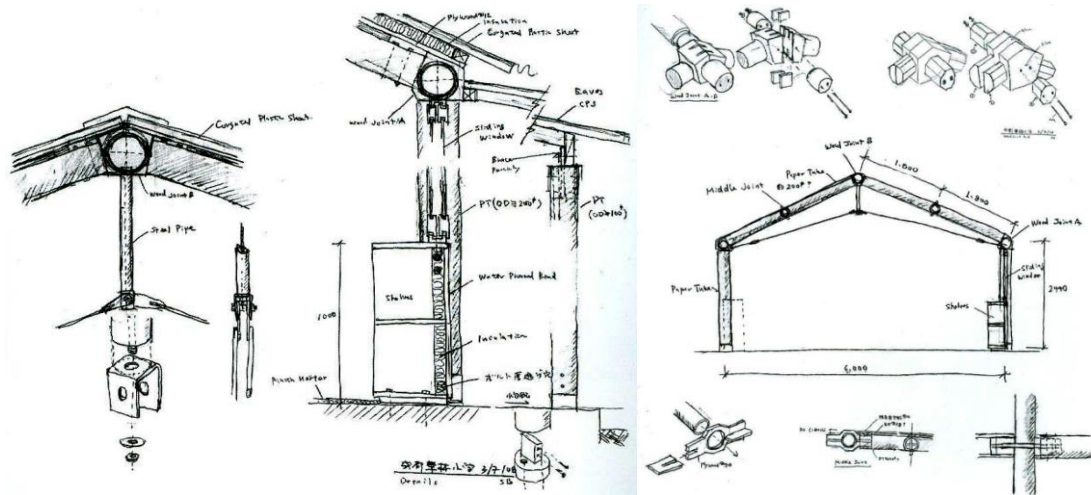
FIGURE 4.29. Ban's sketch – details of the section;²⁷ Details of the timber joints²⁸
